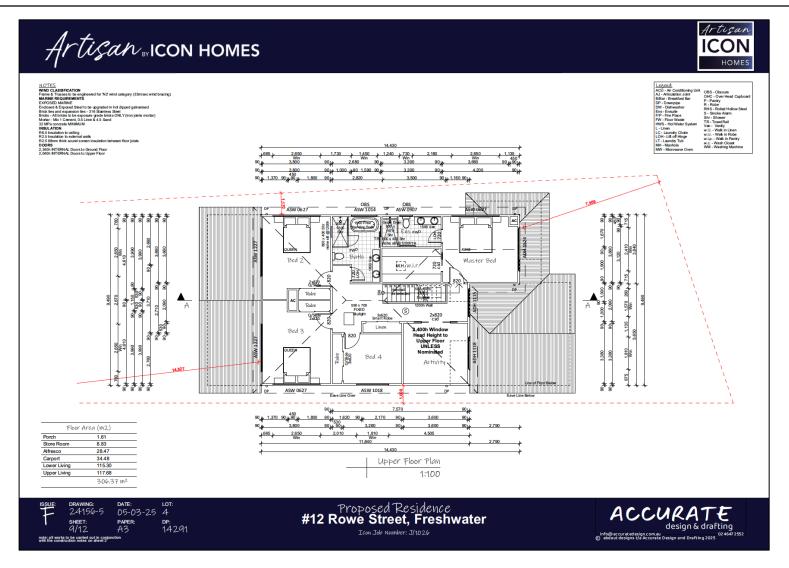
PROPOSED UPPER FLOOR PLAN
